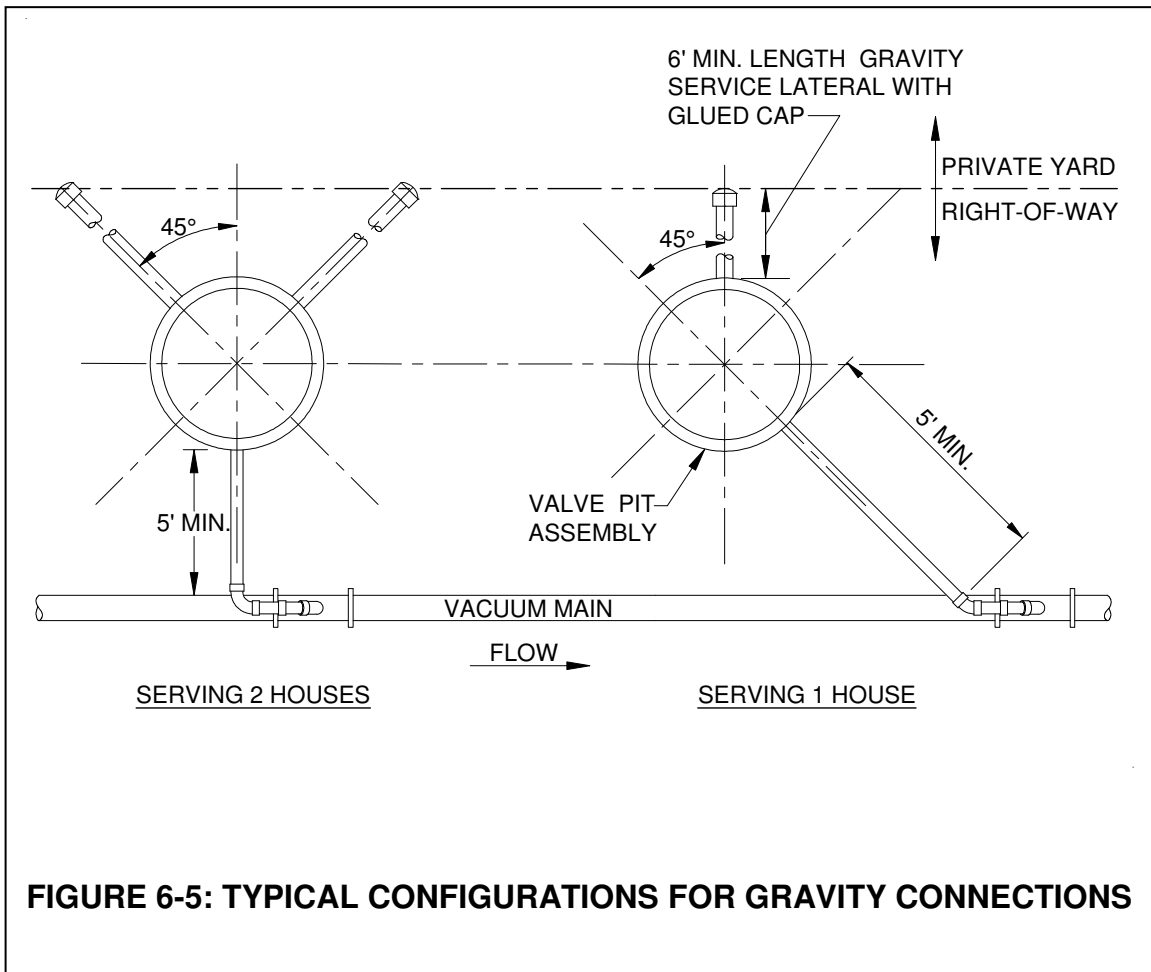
TYPICAL CONFIGURATIONS FOR GRAVITY CONNECTIONS
